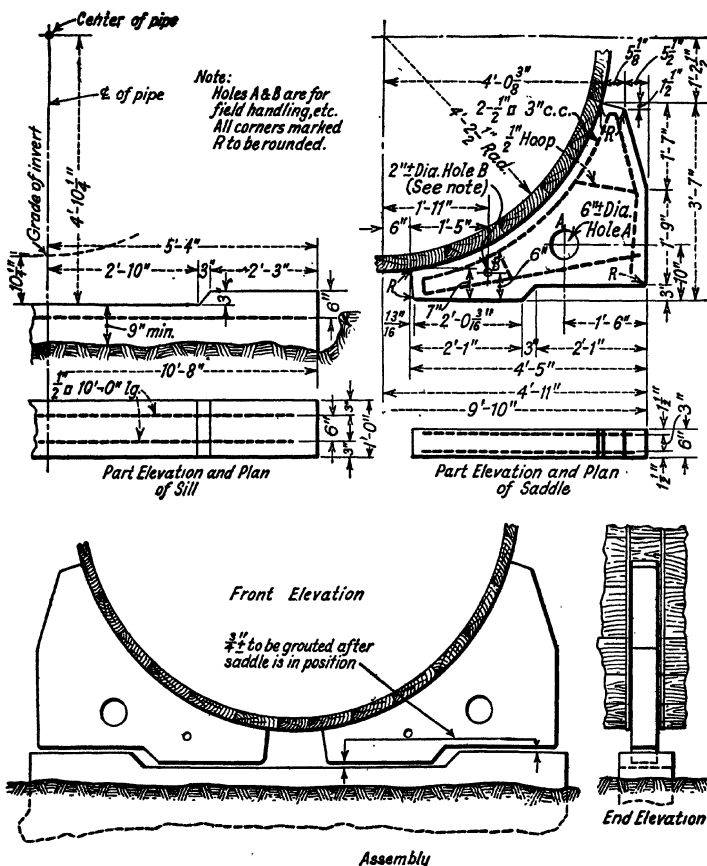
Concrete Saddle and Sill. Searsburg Development of New England Power Co.
